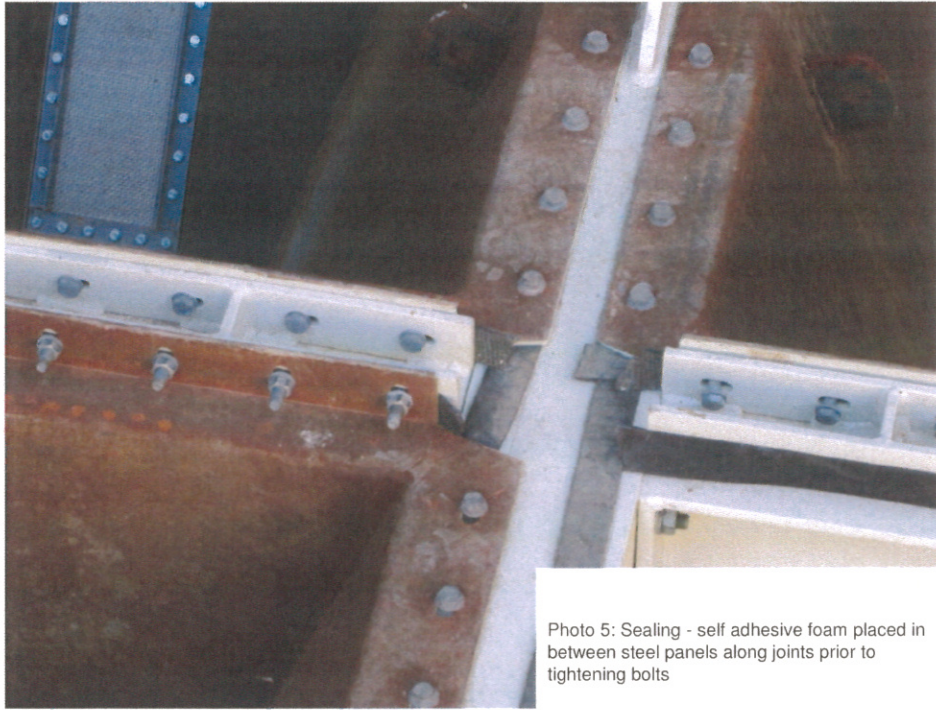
Sealing - self adhesive foam placed in between steel panels along joints prior to tightening bolts
